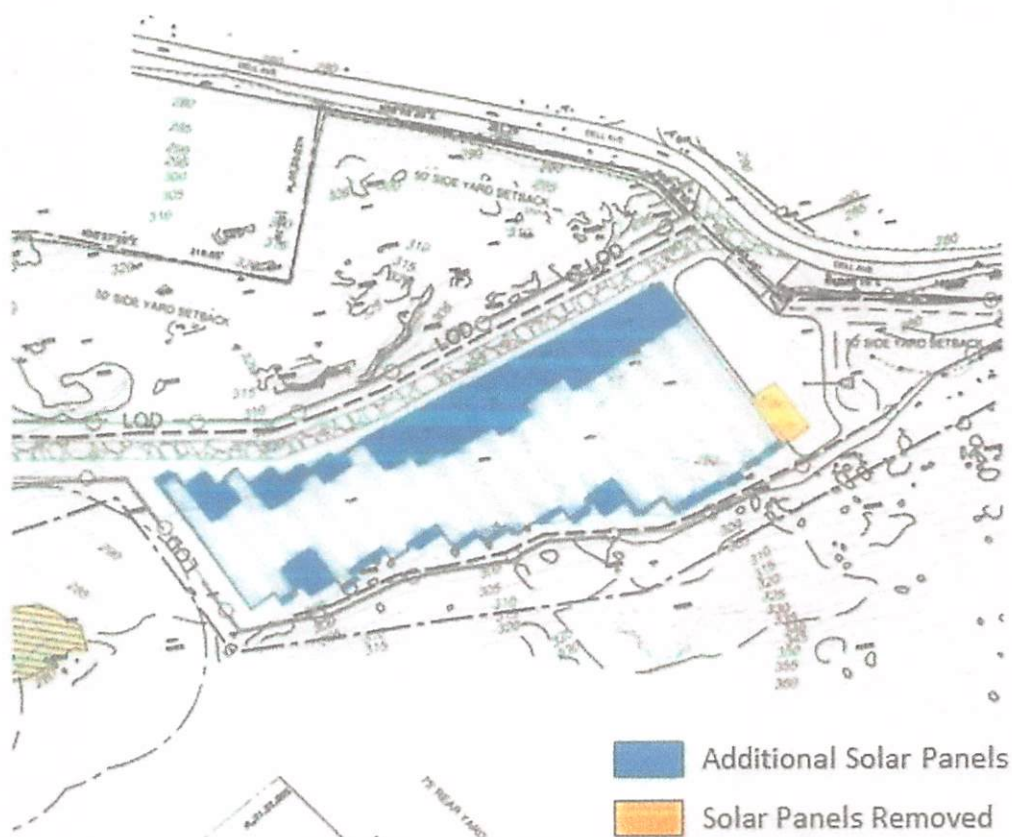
an overlay of the site plan from the VIA on the site plan from the site plan set
